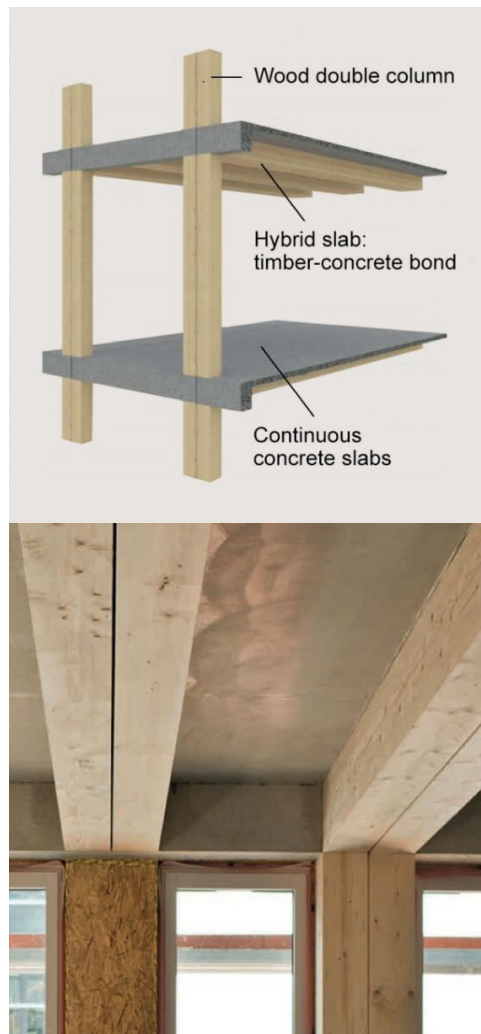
Column and wood-concrete hybrid slab structure (courtesy of CREE).
